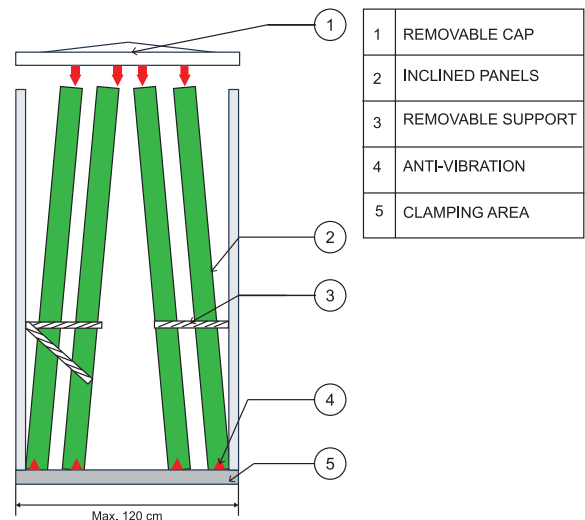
Detailed cross-section for rack design to meet the developed specifications
